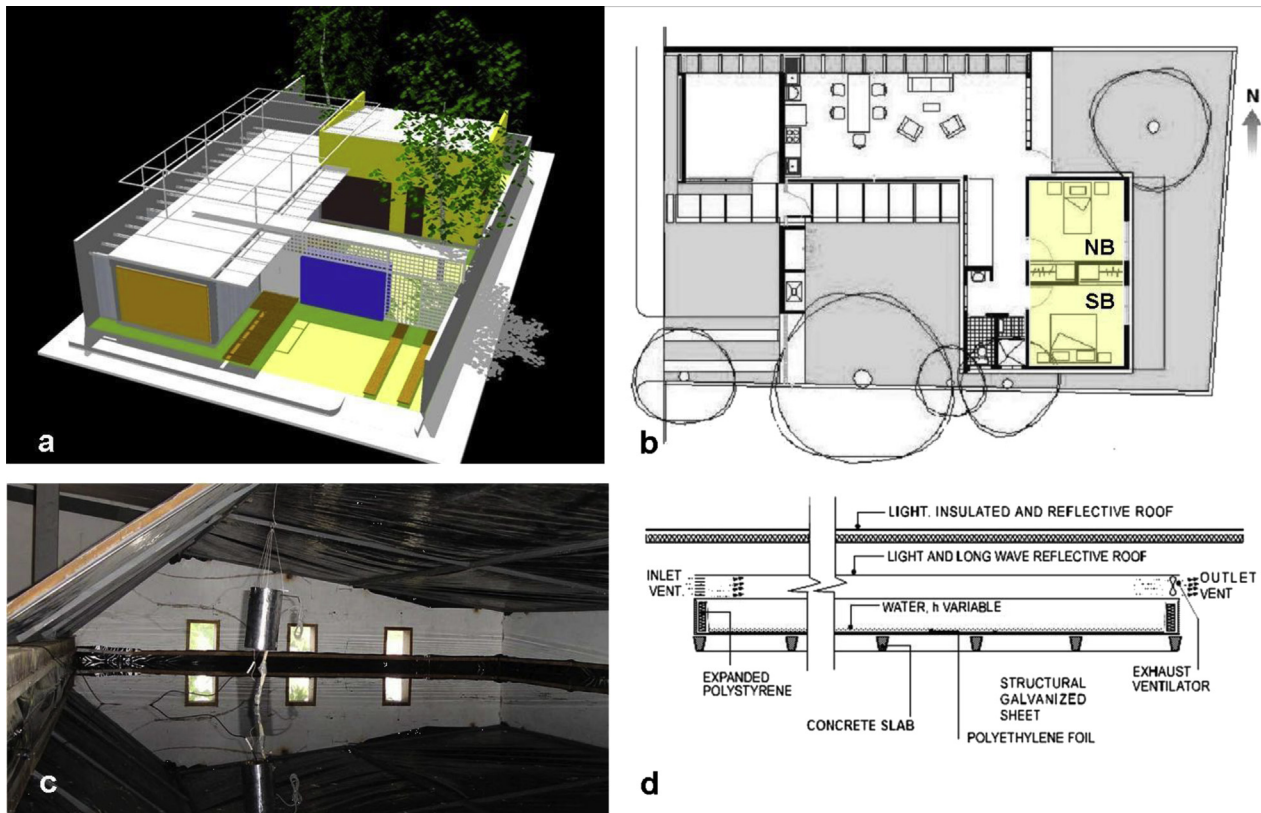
(a) VBP-1, (b) Floor plan, (c) Water tank and roof details (d) IEPCS.
